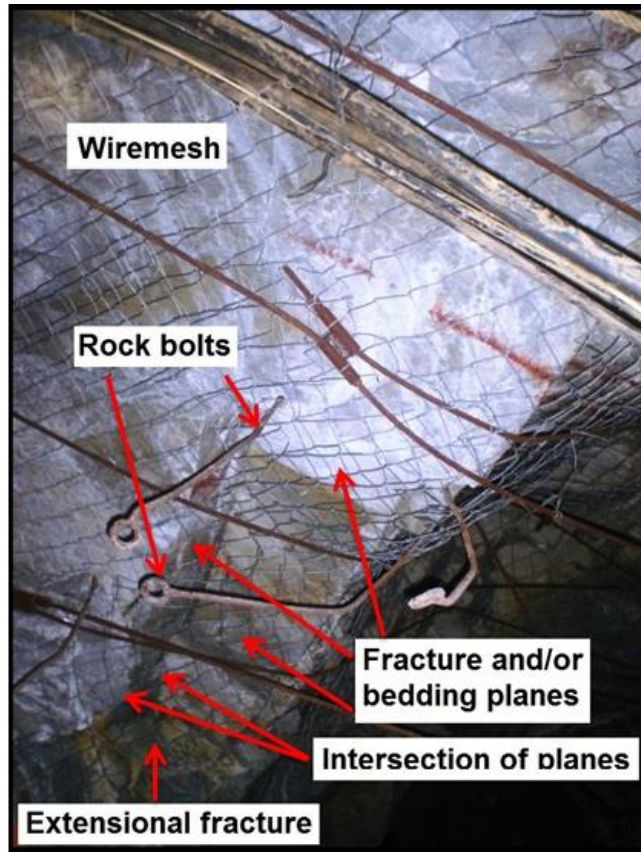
1870 NE E7 X/CUT hanging-wall conditions - 6 January 2011 (provided by BLA Mining Consultants). Rock bolts were manually bended to help keep wiremesh up against the tunnel side walls and hanging-wall. See Section 8.3.4.1 and Figures 8-37 and 8-38.
